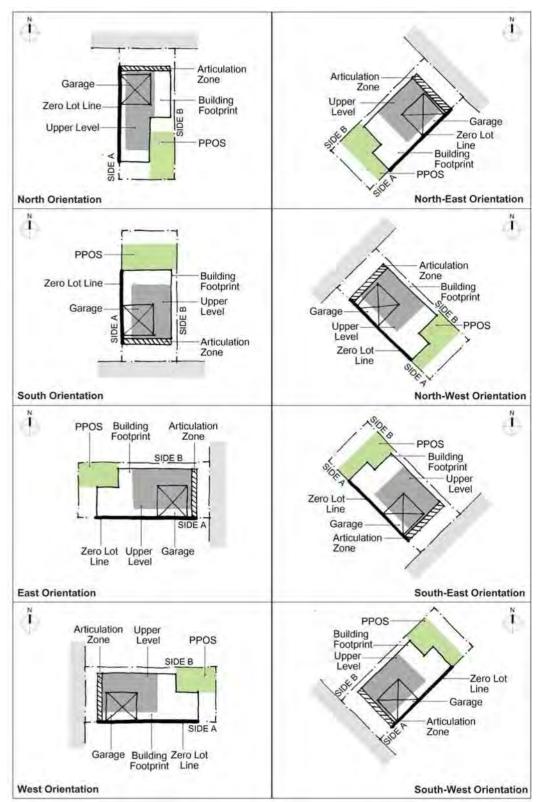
Indicative illustrations of setbacks, private open space and building footprint
